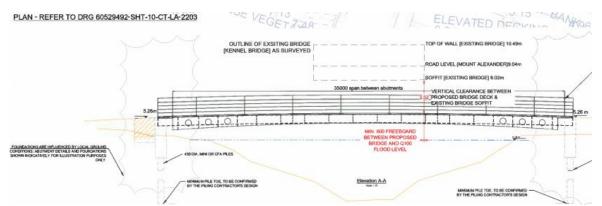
Proposed section of new pedestrian bridge (Bridge A). Drawing 65.
